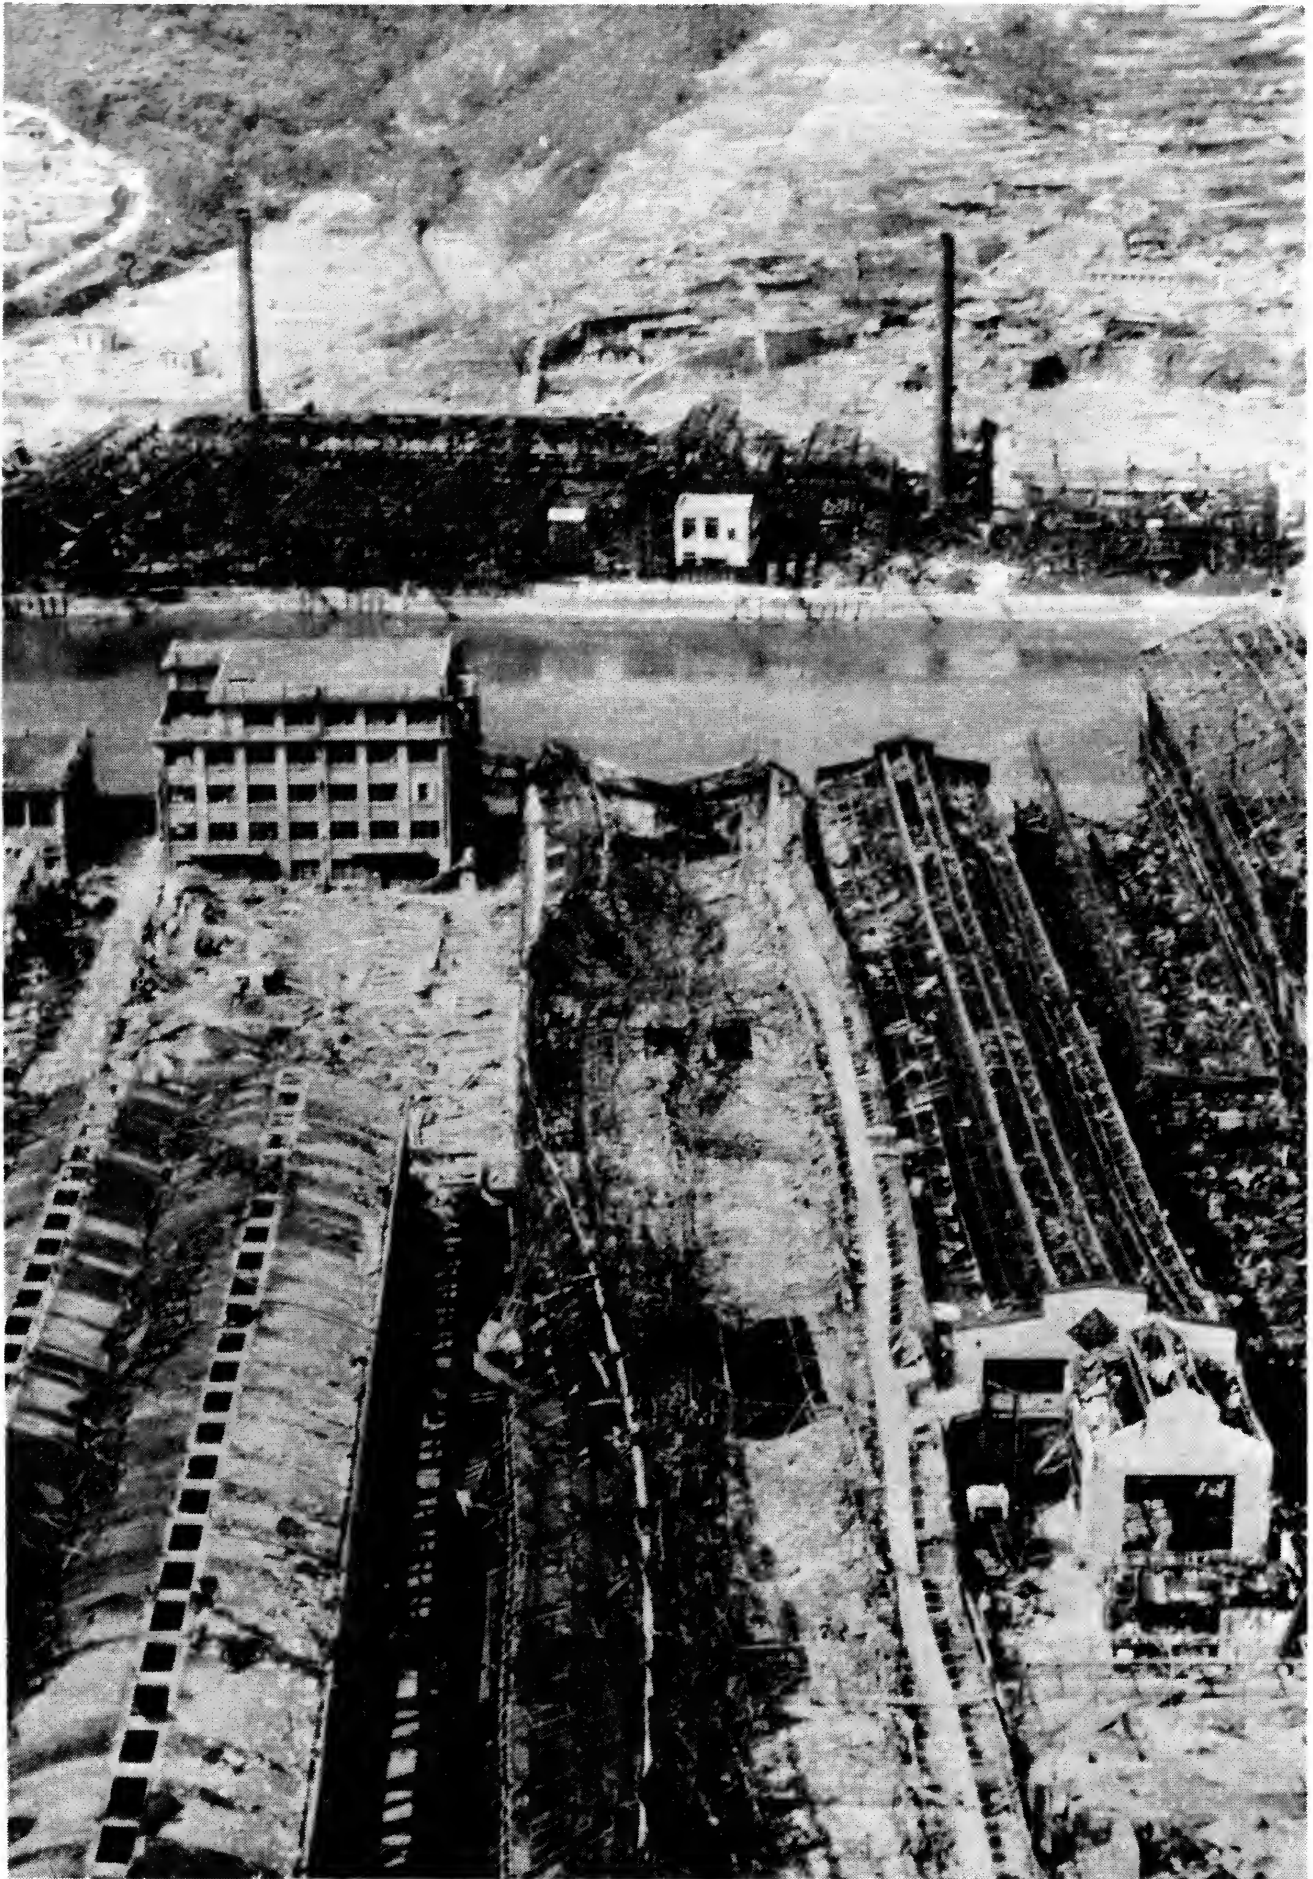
At left and back of center is a multistory, steel-frame building (0.85 mile from ground zero at Nagasaki).
